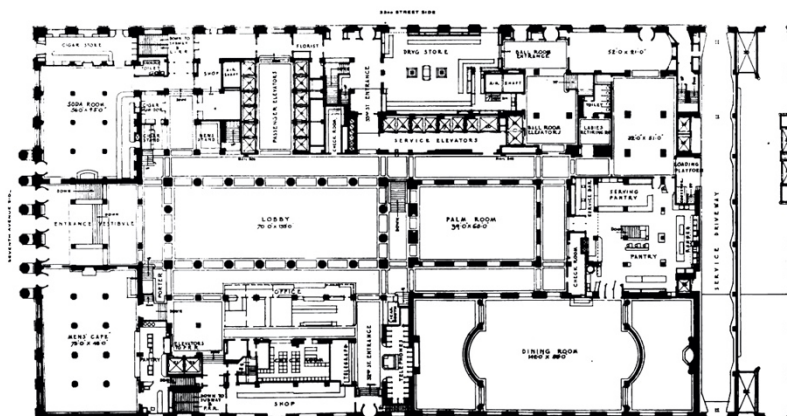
Ground floor plan and graphic analysis of the Hotel Pennsylvania. New York. Architects McKim, Mead & White. 1919
